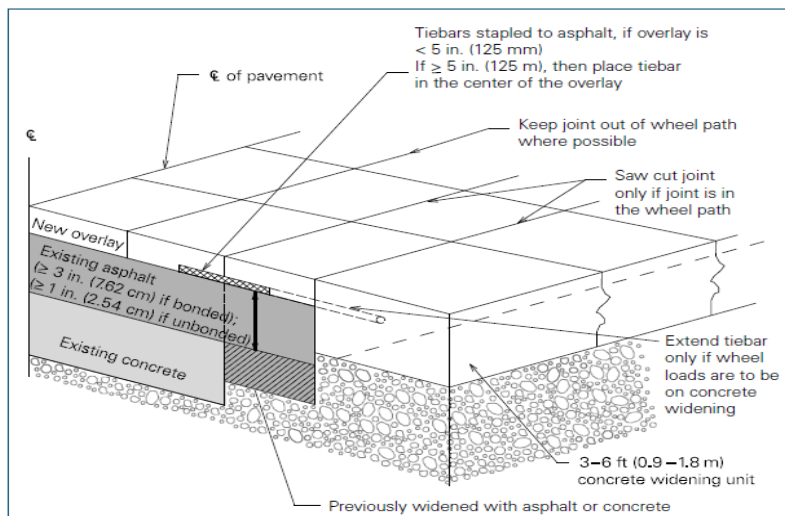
Initial Pavement Design Concept (Harrington 2008).
